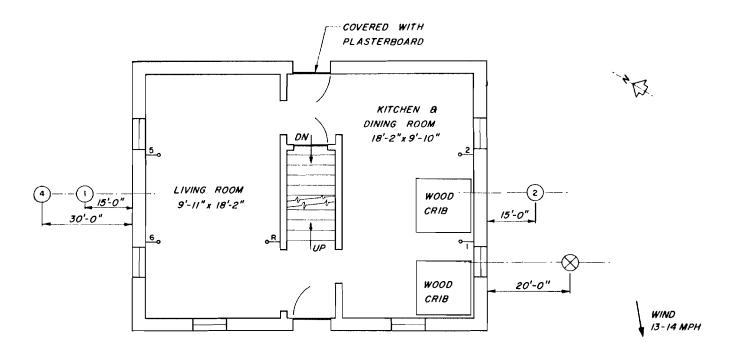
BUILDING No. 2 - TWO - STOREY SOLID BRICK DWELLING
